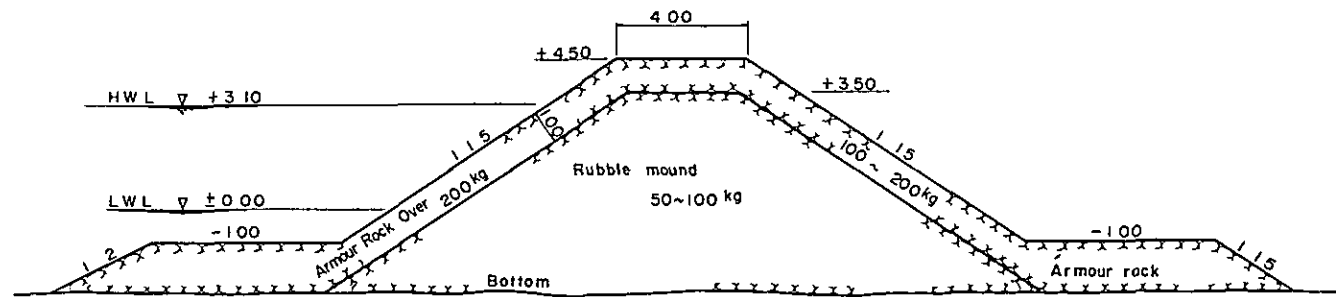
(a) STANDARD SECTION OF OUTER FACILITIES
